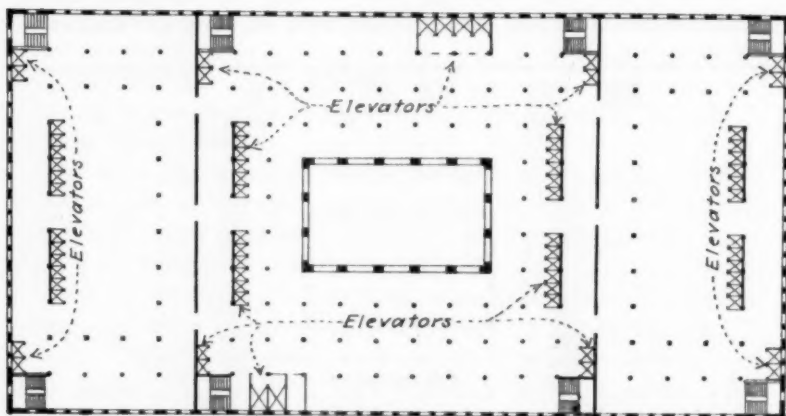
SUGGESTED ARRANGEMENT OF FIRE WALLS, ELEVATORS AND STAIRS FOR DEPARTMENT STORE
